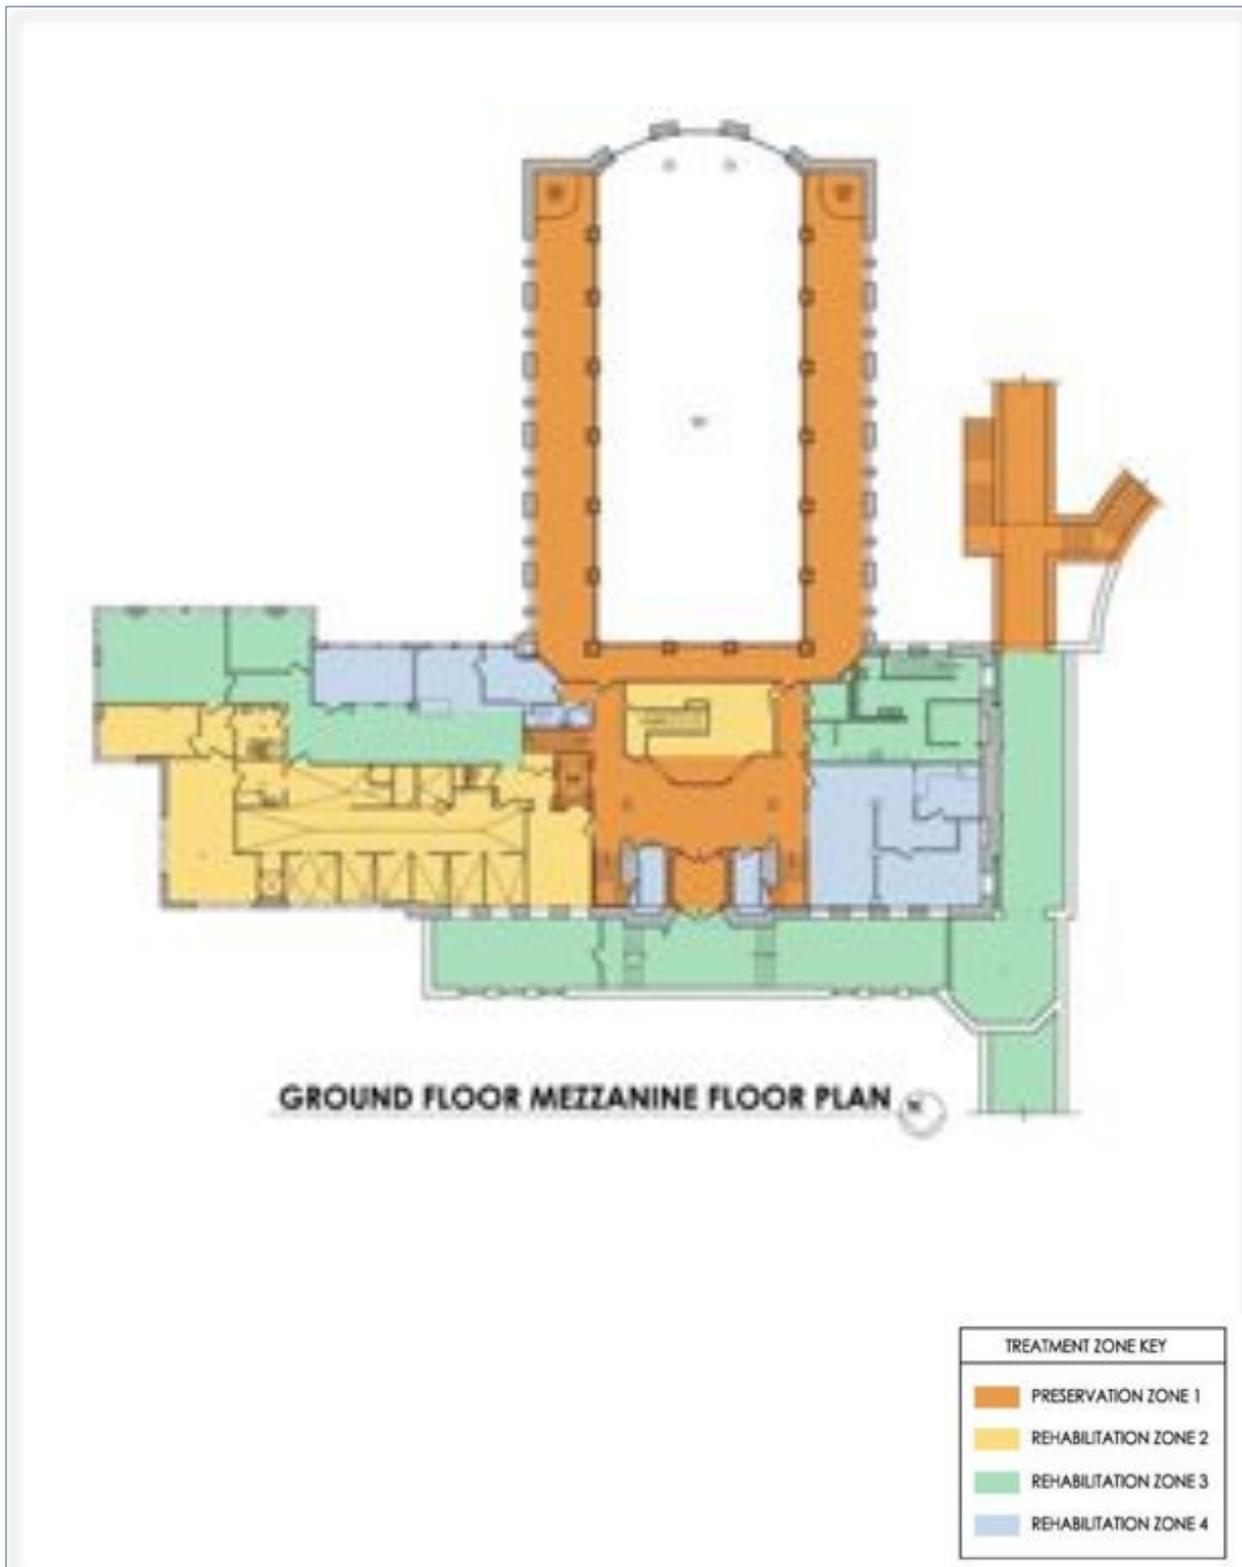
Preservation Treatment Zone Diagram – Ground Floor Mezzanine Plan (SRJA 2013)
